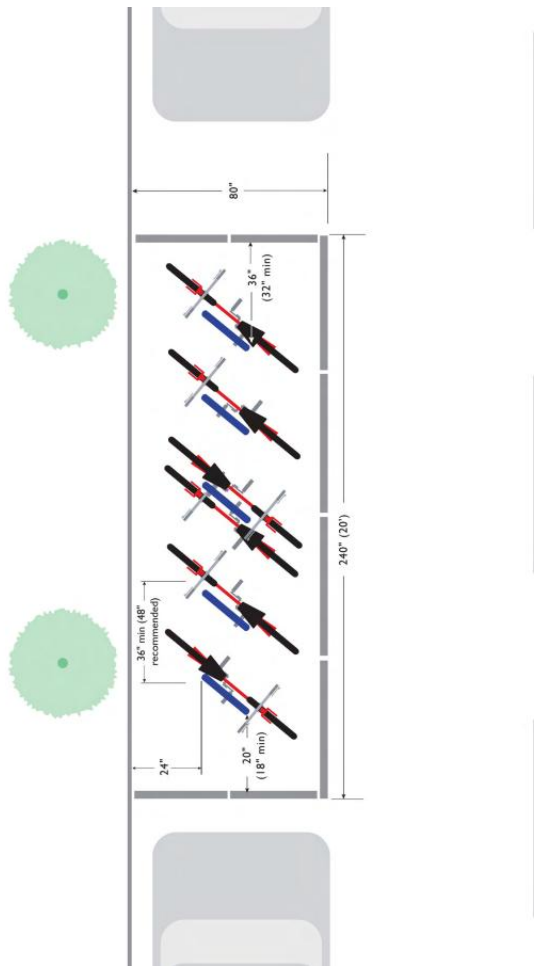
Typical Layout of a Bike Parking Area on Private Property (Source: APBP<sup>2</sup>)
